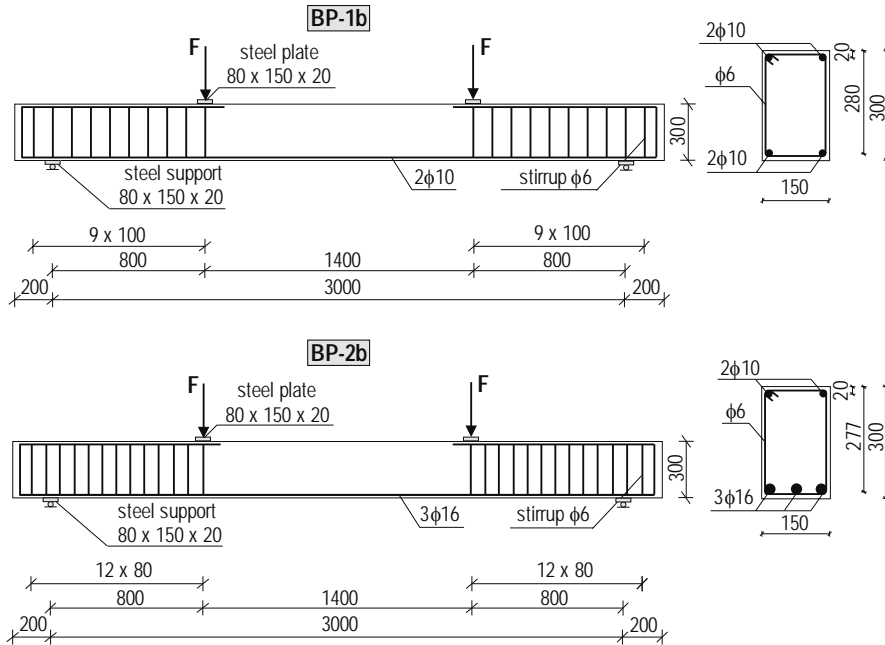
Dimensions and cross-section of BP beams with reinforcement and loading arrangements
